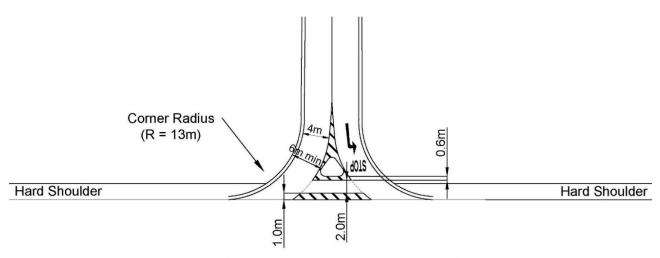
Direct Access Layout 2 – Access to Dwellings
